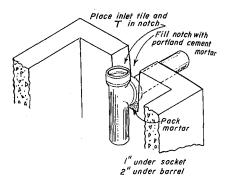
This shows how inlet and outlet tile are mortared into notch at end of septic tank.
